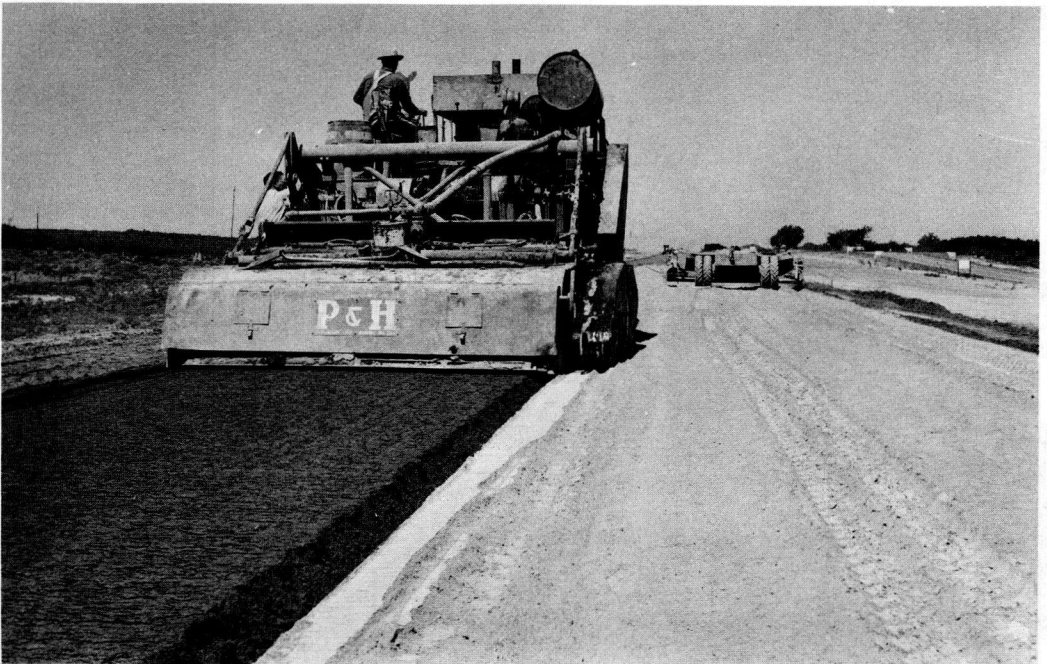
Flat-type mixing machine processing soil-cement in-place.
